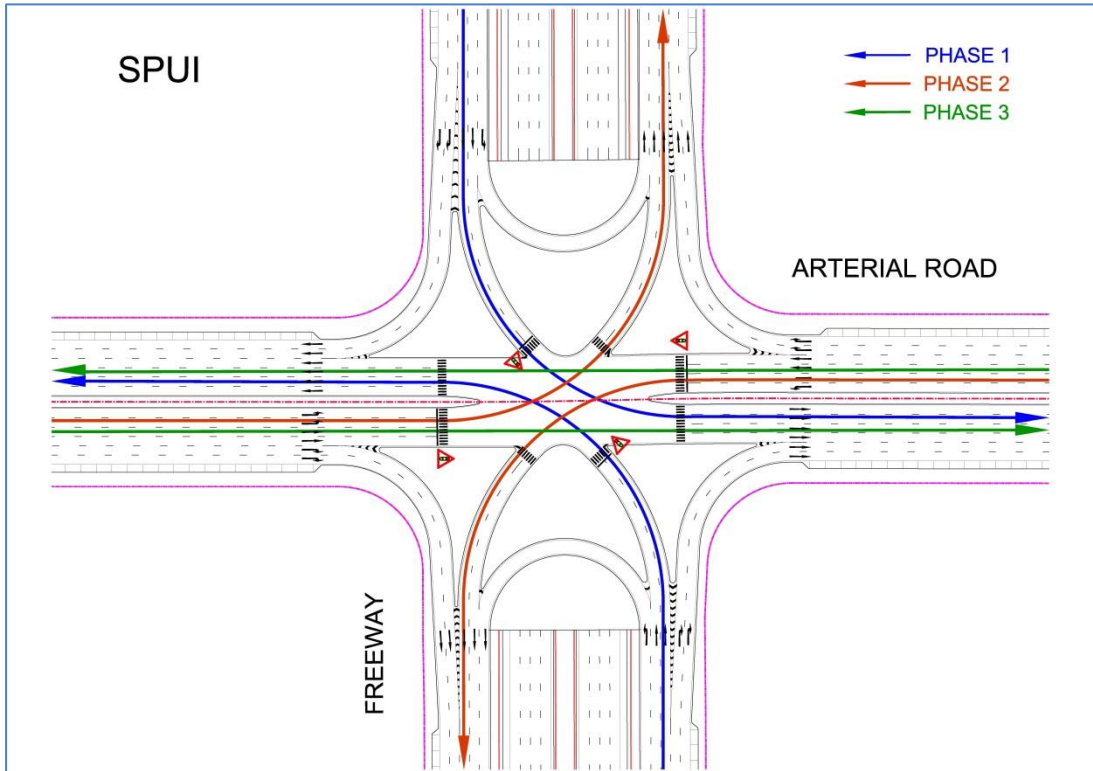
Layout Plan for a Single Point Urban Interchange (SPUI)
